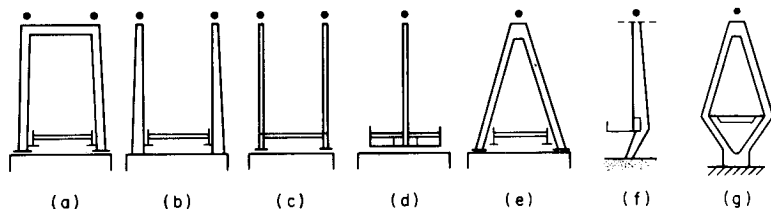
Shapes of pylons used for cable-stayed bridges. (a) Portal frame with top cross member. (b) Pylon fixed to pier and without top cross member. (c) Pylon fixed to girders and without top cross member. (d) Axial pylon fixed to superstructure. (e) A shaped pylon. (f) Laterally displaced pylon fixed to pier. (g) Diamond-shaped pylon. (Reprinted with permission from A. Feige, "The Evolution of German Cable-Stayed Bridges—An Overall Survey," *Acier-Stahl-Steel* (English version), no 12, December 1966 (reprinted in the *AISC Journal*, July 1967.)
